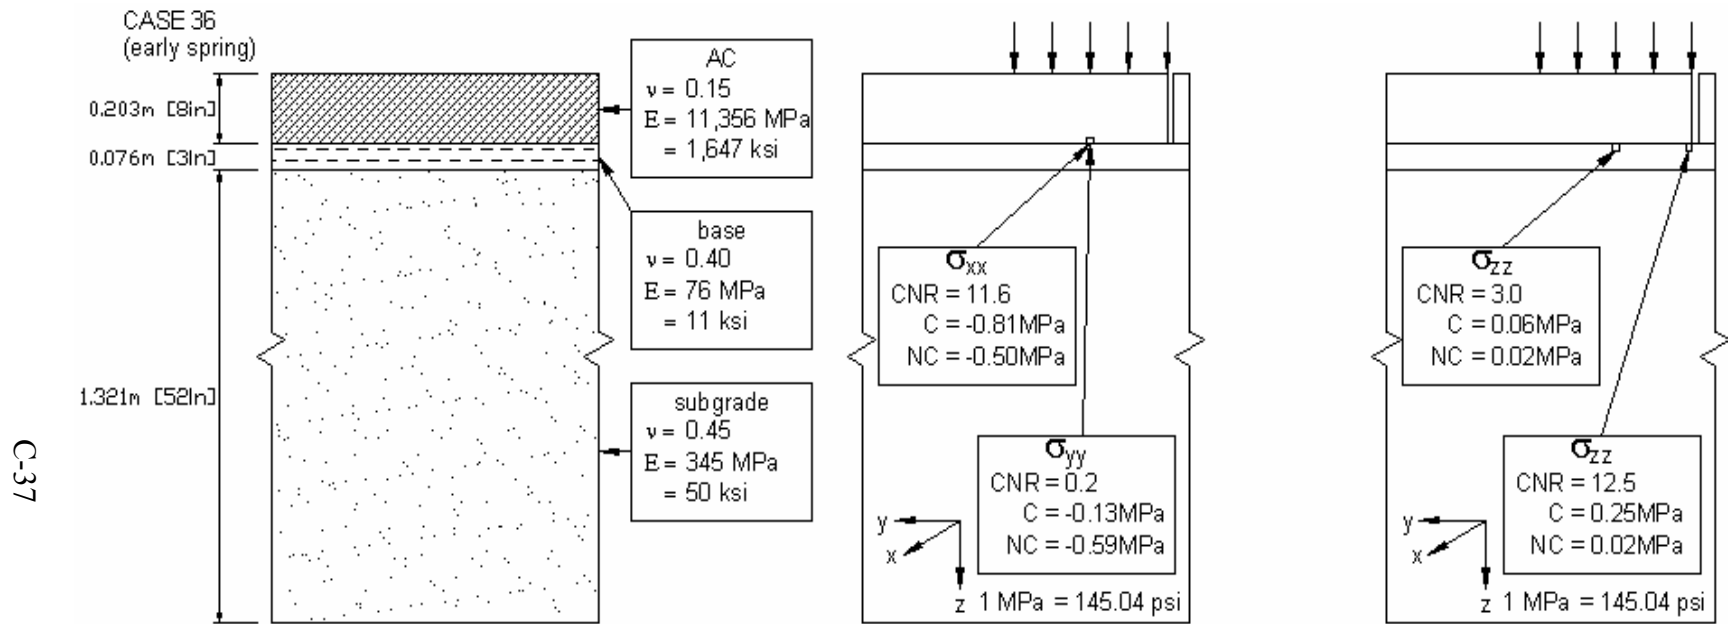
Summary cross section for case 36, (C – stress in cracked pavement, NC – stress in pavement with no crack, CNR – crack/no crack (stress) ratio)
